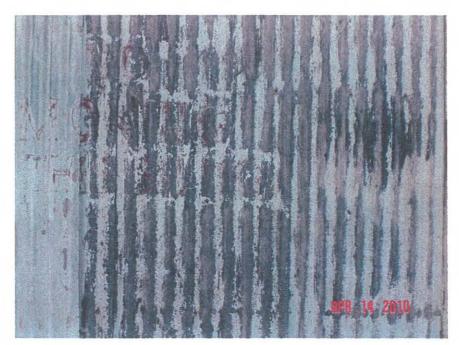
Door with blue/greenish paint on door of metal building as seen in photo 1.
